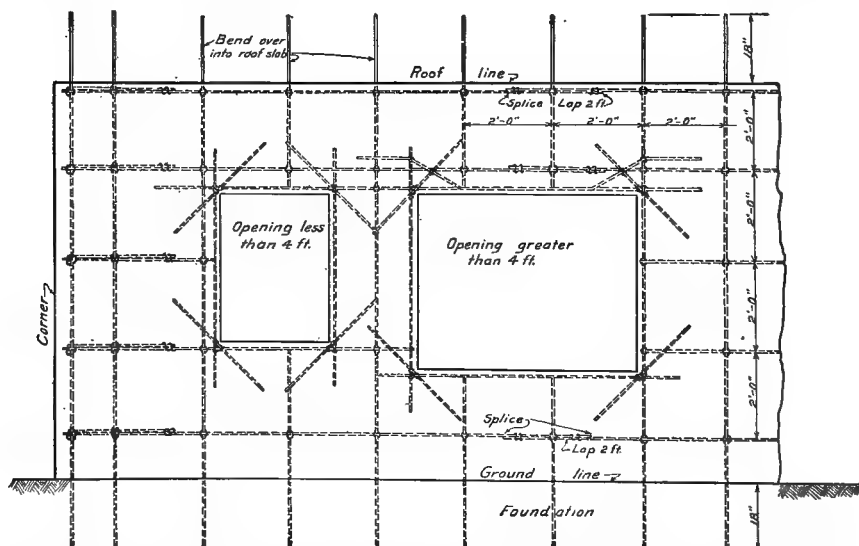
Diagram showing the general scheme for reinforcing monolithic walls for small buildings limited to one story in height.
